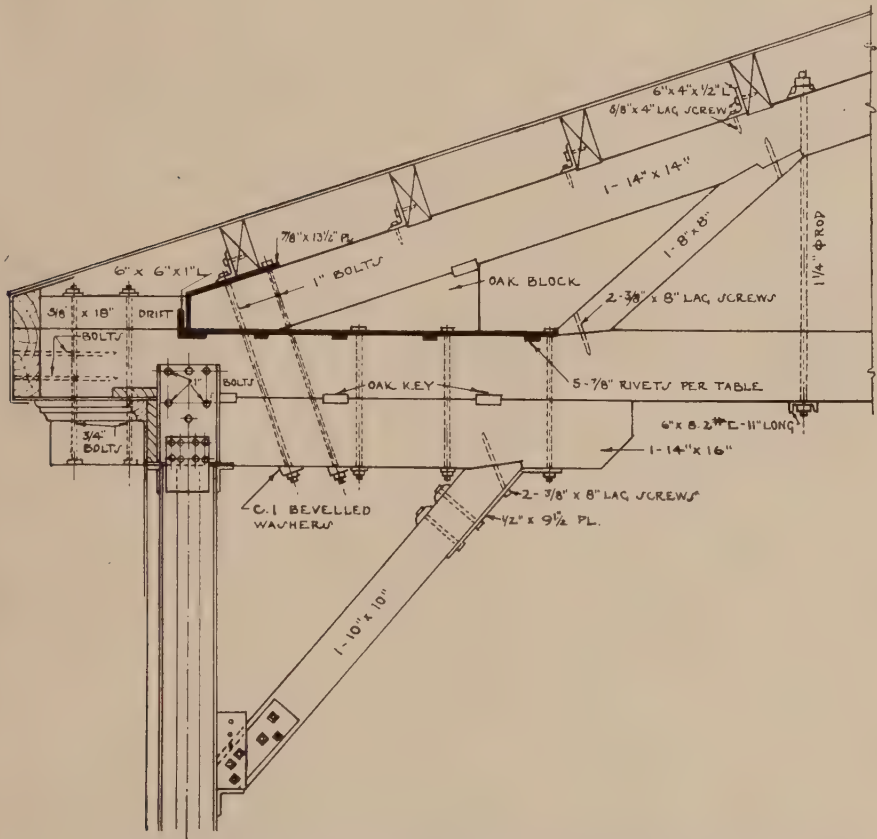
End joint detail for a roof truss, Union Pacific Railroad locomotive shop.
